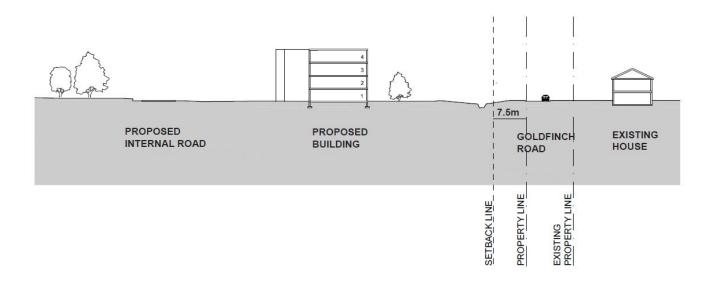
Section through 4-storey buildings along Goldfinch Road looking northeast
